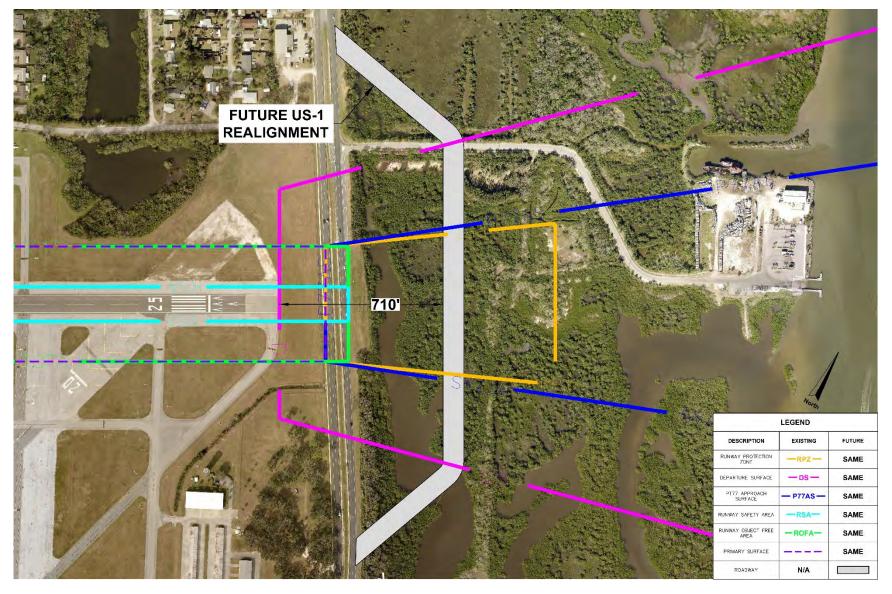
ALTERNATIVE 1B: RELOCATION OF U.S. 1 TO ACCOMMODATE RUNWAY 25 APPROACH SLOPE
